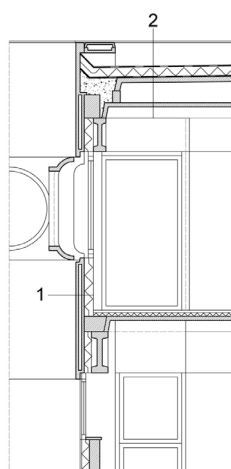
The commercial pavilion by Grunwaldzki Square—section. 1. The designed wall: reinforced concrete prefabricates with an internal void of 5.0 cm—cleaning, fulfilling subsidence 15.0 cm, internal isolation of Multipor-type boards 5.0 cm, and Heradesign-type boards in natural color on a wooden grid 2.5 cm. 2. The designed roof: EPDM film, Styrodur 20.0 cm, vapor-permeable foil, cement screed 1.0 cm, sloped roof panels (channeled, reinforced concrete) 25.0 cm, ventilation gap 5.0–30.0 cm, slag wool 6.0 cm, and structural ceiling (reinforced concrete beams and trough slabs, reinforced concrete) 30.0 cm (drawn by the Authors).
